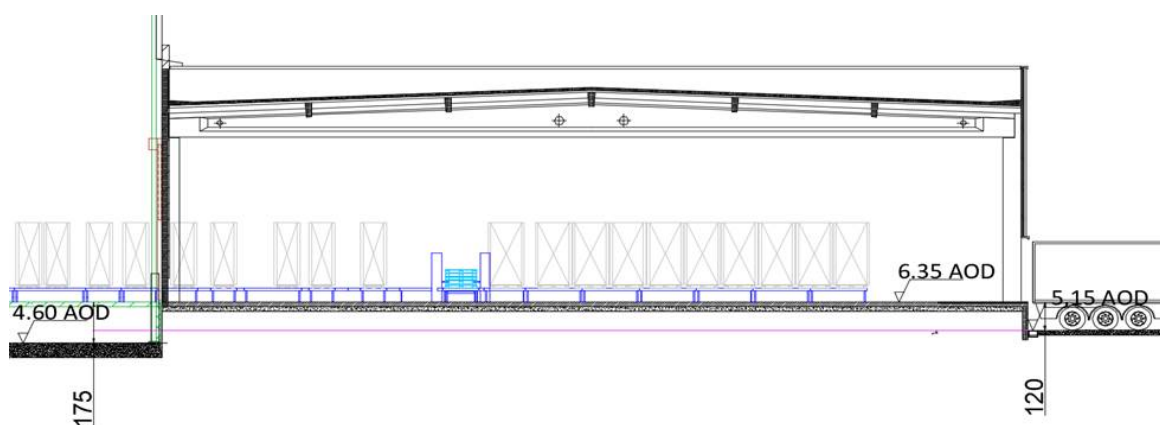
Illustration of the Dispatch building, loading bays and HBW
